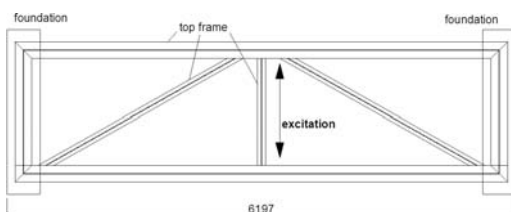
A plan view of the test, showing the foundations, top frame, and shaking direction.
